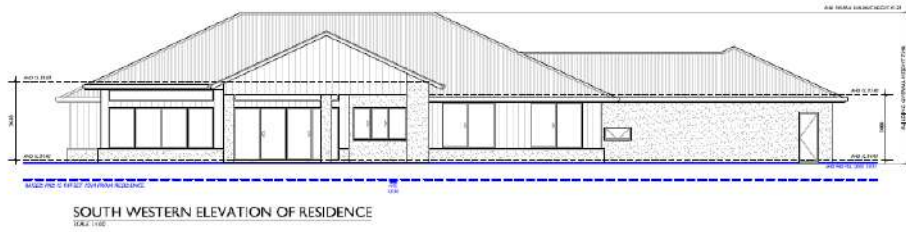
Extract Elevation Plans Jackson and Fapio Pty Ltd
